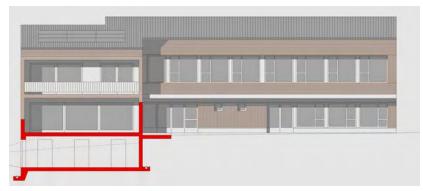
View from south of renovated caretakers apartment (left) and school building (right) (source: Bruno Thoma)
